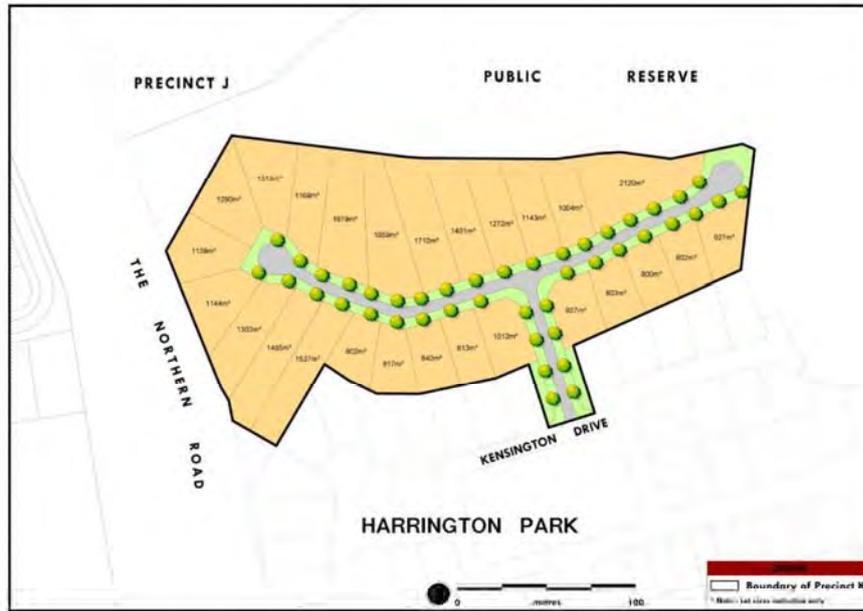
Harrington Grove Precinct K Indicative Layout Plan
